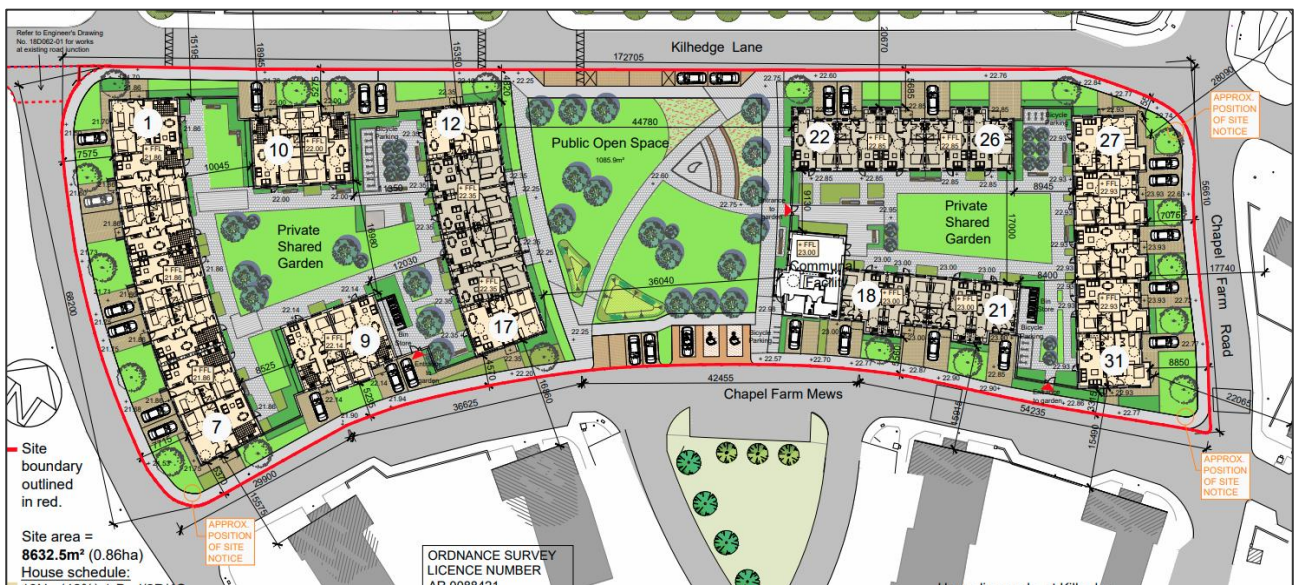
PROPOSED SITE LAYOUT (SOURCE: WALSH ASSOCIATES)
